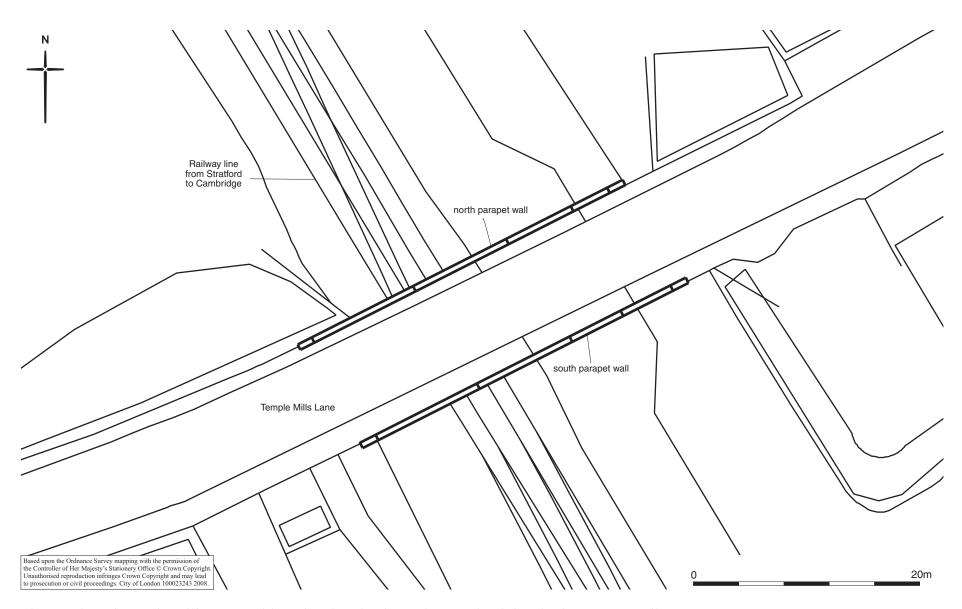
Plan of Temple Mills Lane Bridge, showing the thermal expansion joints in the parapet walls
